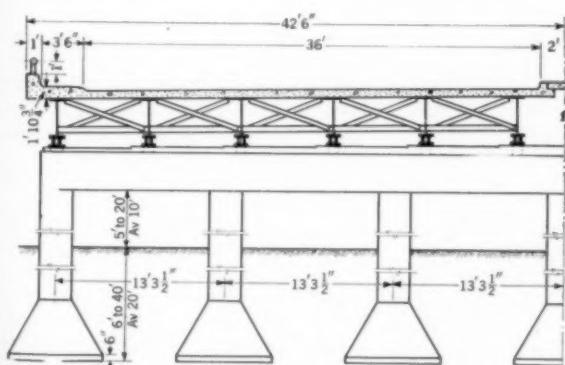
ROADWAY is supported on round reinforced concrete columns with under-reamed bell-shaped footings. No forms are required below ground.
